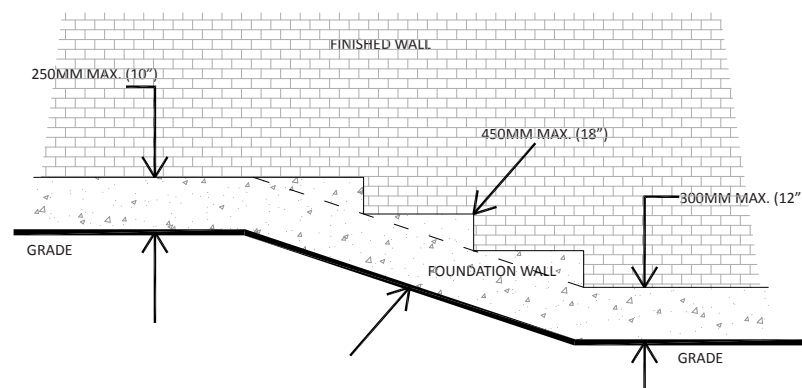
Stepped foundation wall detail for steeply sloped conditions with a 450mm maximum allowable exposed foundation wall dimension on non-publicly exposed elevations
